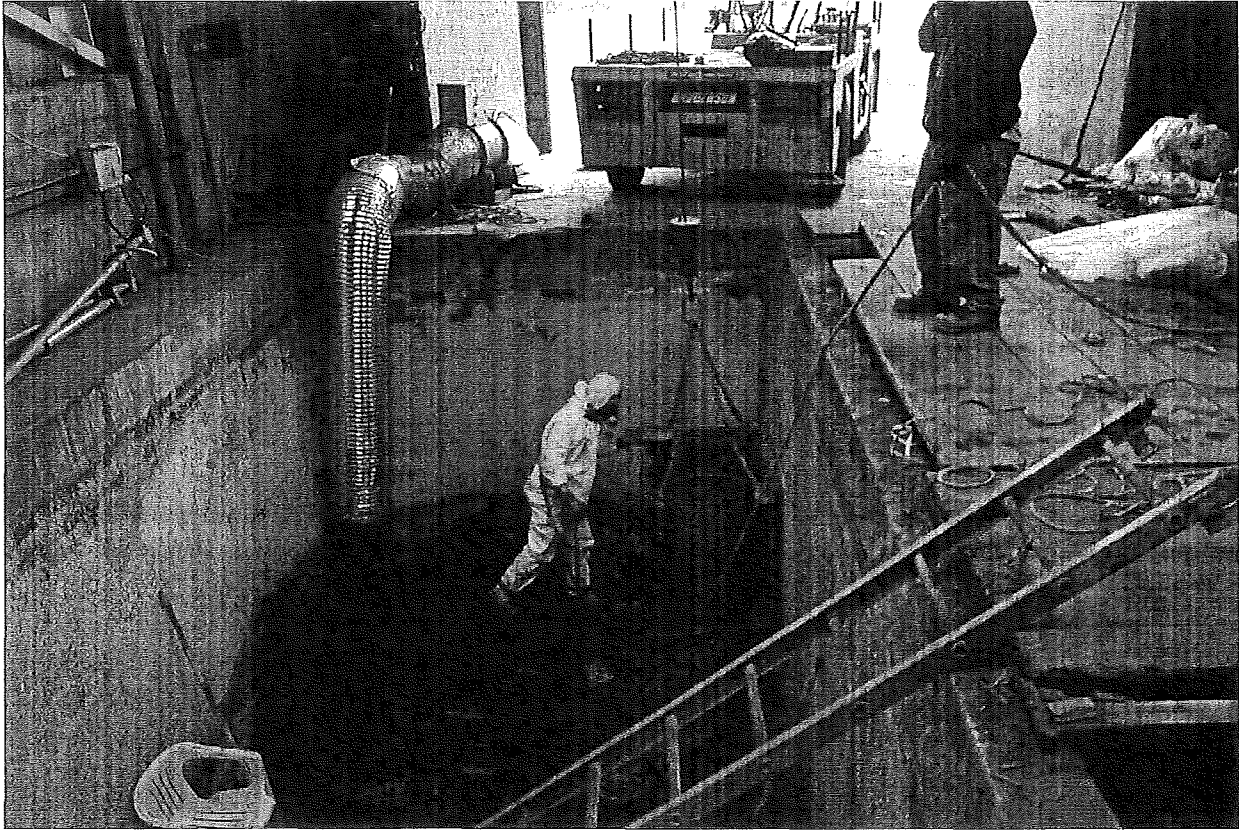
Cleaning out pit where one of two large plating vats was housed.
